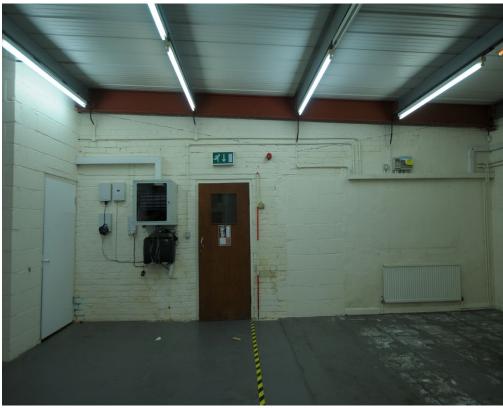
The W wall of Unit 3 showing the original 19th century roof line, facing W
